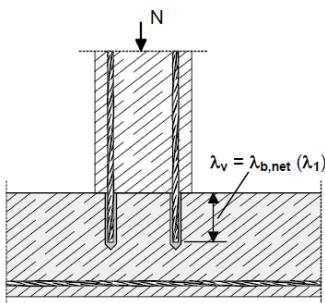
Rebar connection for components stressed primarily in compression. The rebars are stressed in compression
